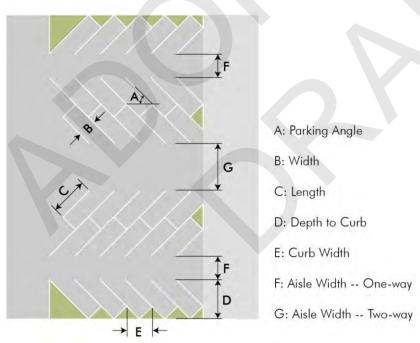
Parking Dimensions Dimensions standards of Table 7-7, applied to typical parking layouts.
